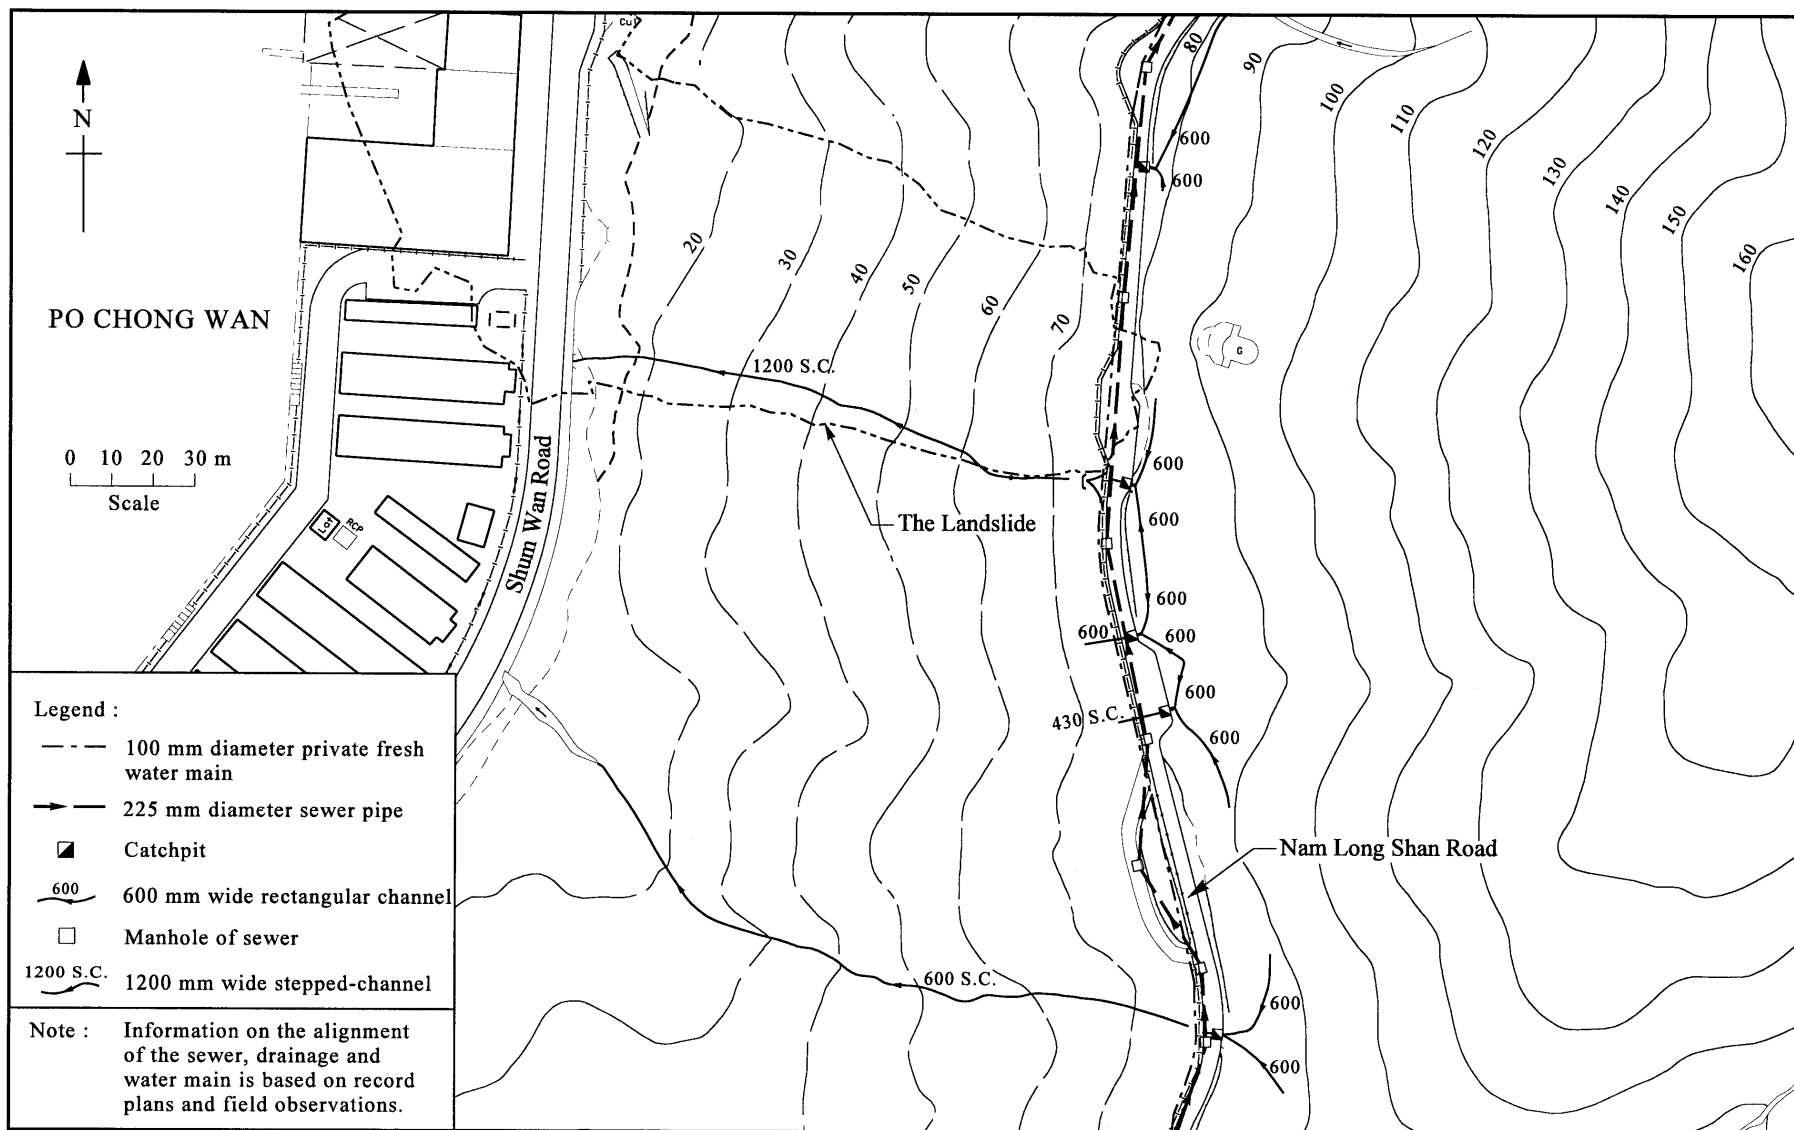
Layout of Drainage and Water-carrying Services at Nam Long Shan Road
